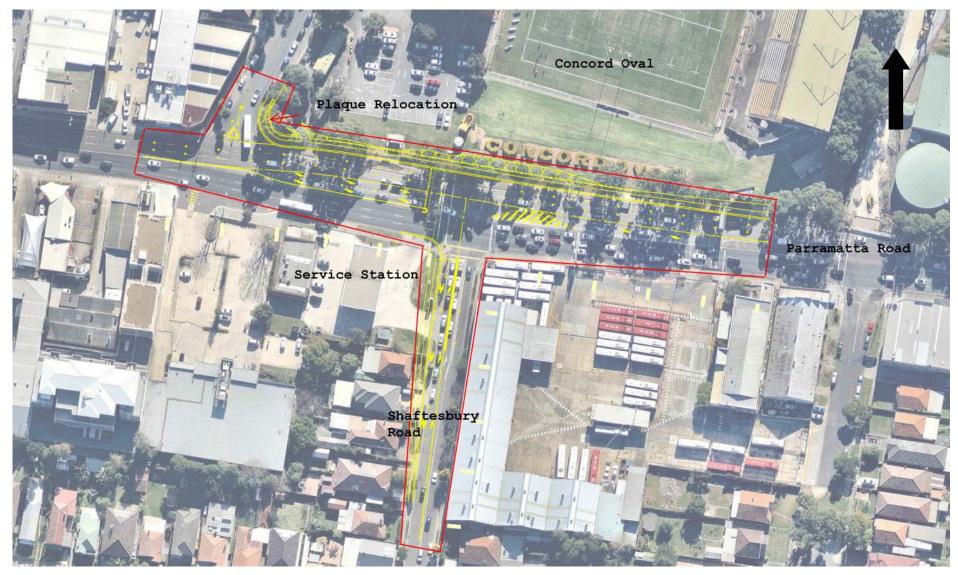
Design of the proposed Parramatta Road & Shaftesbury Road intersection upgrade. The proposal area boundary is shown in red.
